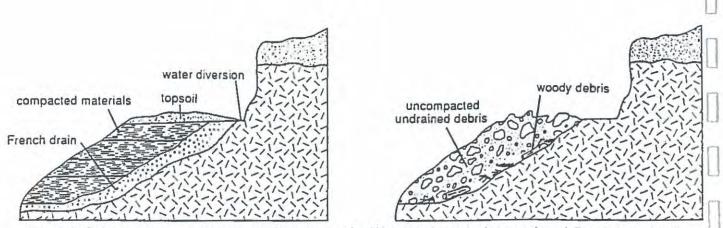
Before overburden waste is placed (left), vegetation should be cleared, and the drainage planned. French drains should be installed beneath the waste piles. Overburden should then be laid down in compacted layers. Water must be diverted away from the fill. Topsoil placed over the compacted fill will promote self-sustaining vegetation. Uncompacted, Improper fill (right) with no drainage that is placed over woody material can fail by landslides that may flow onto nearby lands and into water bodies.
